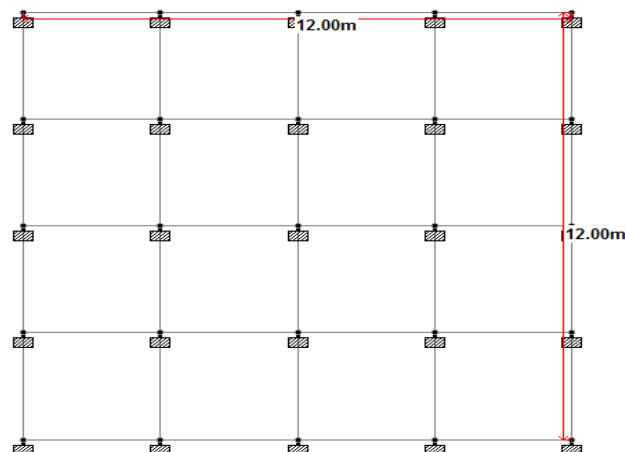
Plan of buildings frames for all cases of Groups (1, 2, 3,4)
